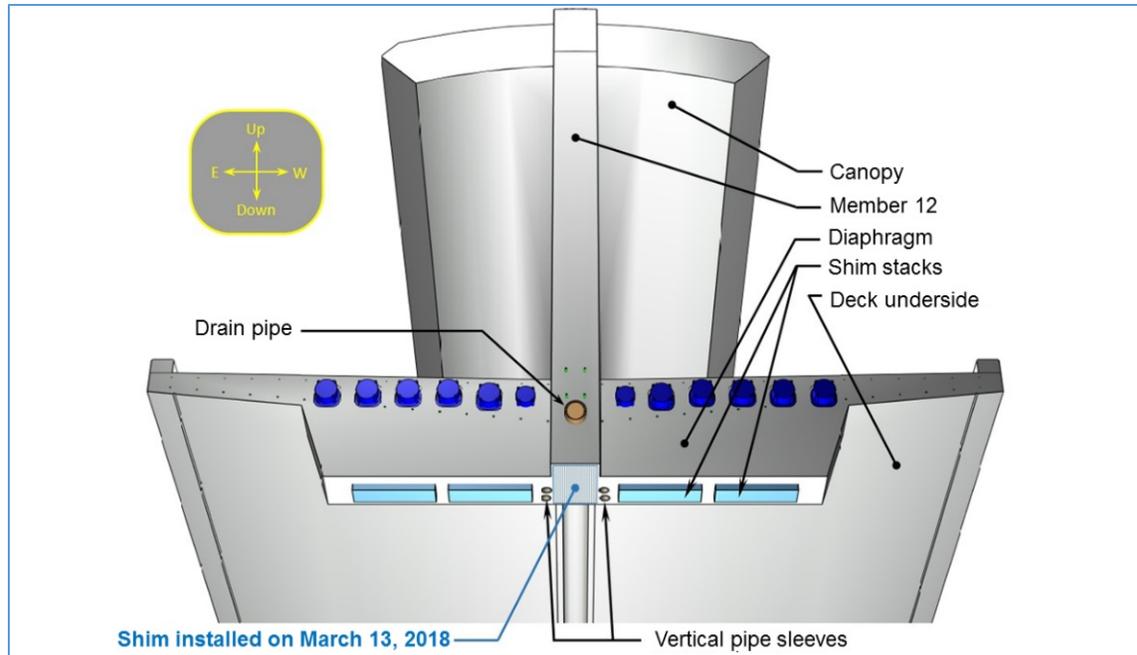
View of underside of post-SPMT support location of pylon diaphragm onto pylon pier, showing shim stacks on east and west side of diaphragm centerline. Post-SPMT support location is at underside of pylon pier deck. (Source: FHWA 2019)
